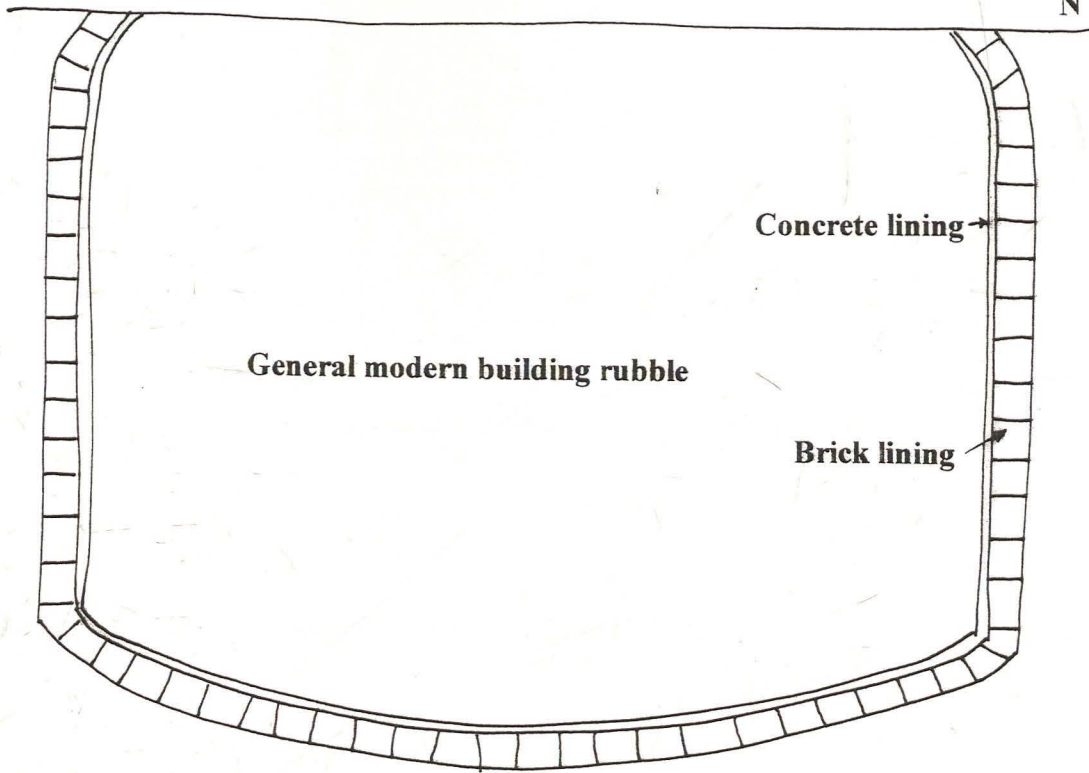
Section through sluice pit encountered during excavation for Plot 5
